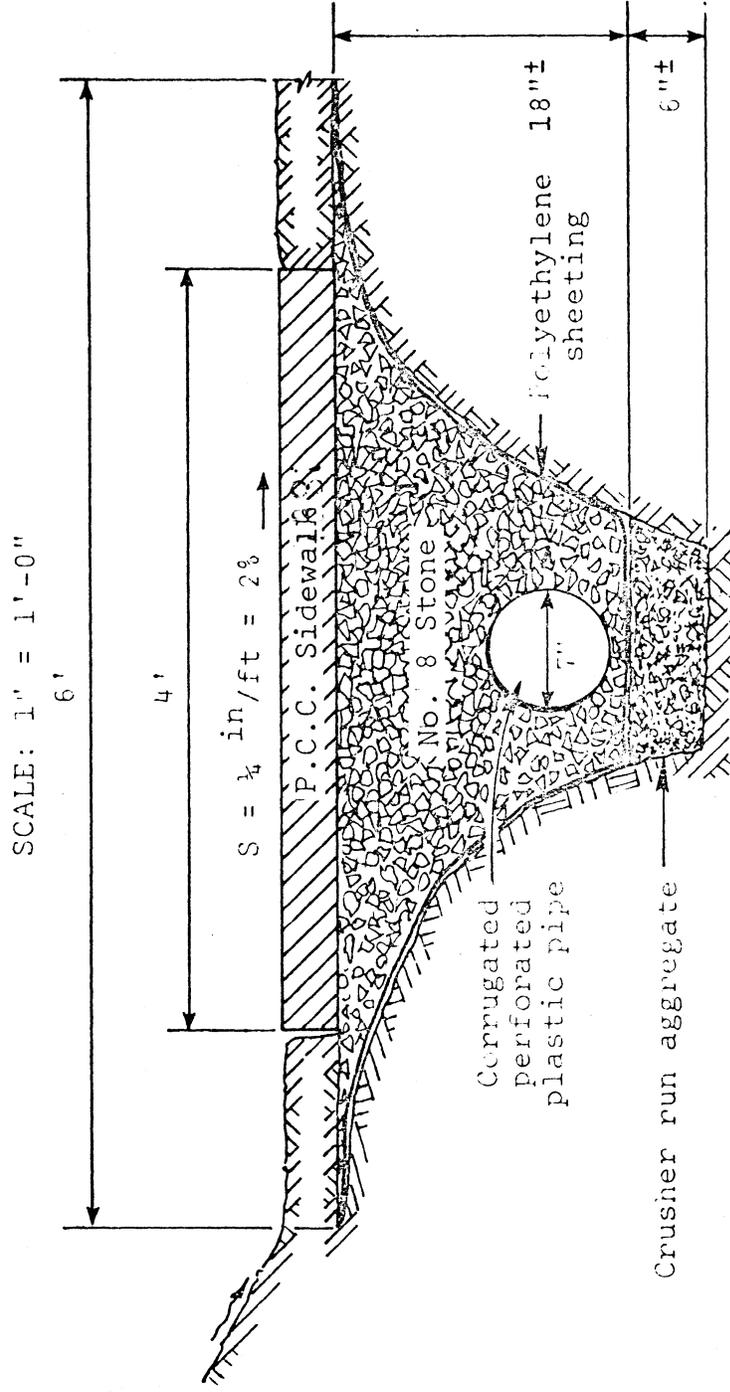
Cross section of experimental sidewalk installation. (1 ft. = 0.3 m)
